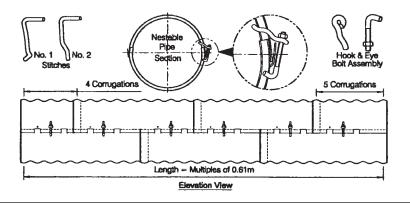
Notched nestable pipe can be joined with stitches or a hook and eye bolt assembly.
